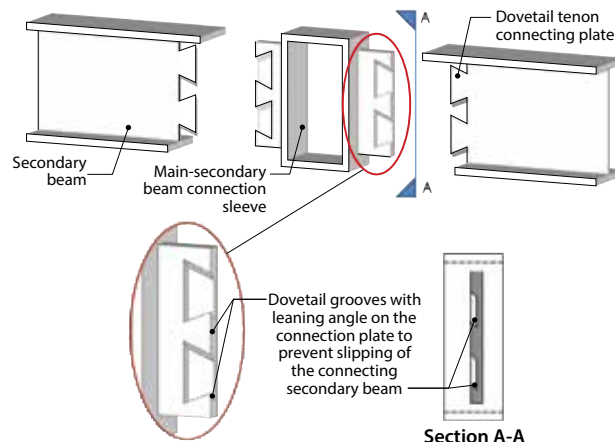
Disassembled components for a main-secondary beam joint using dovetail mortise connecting plate.
